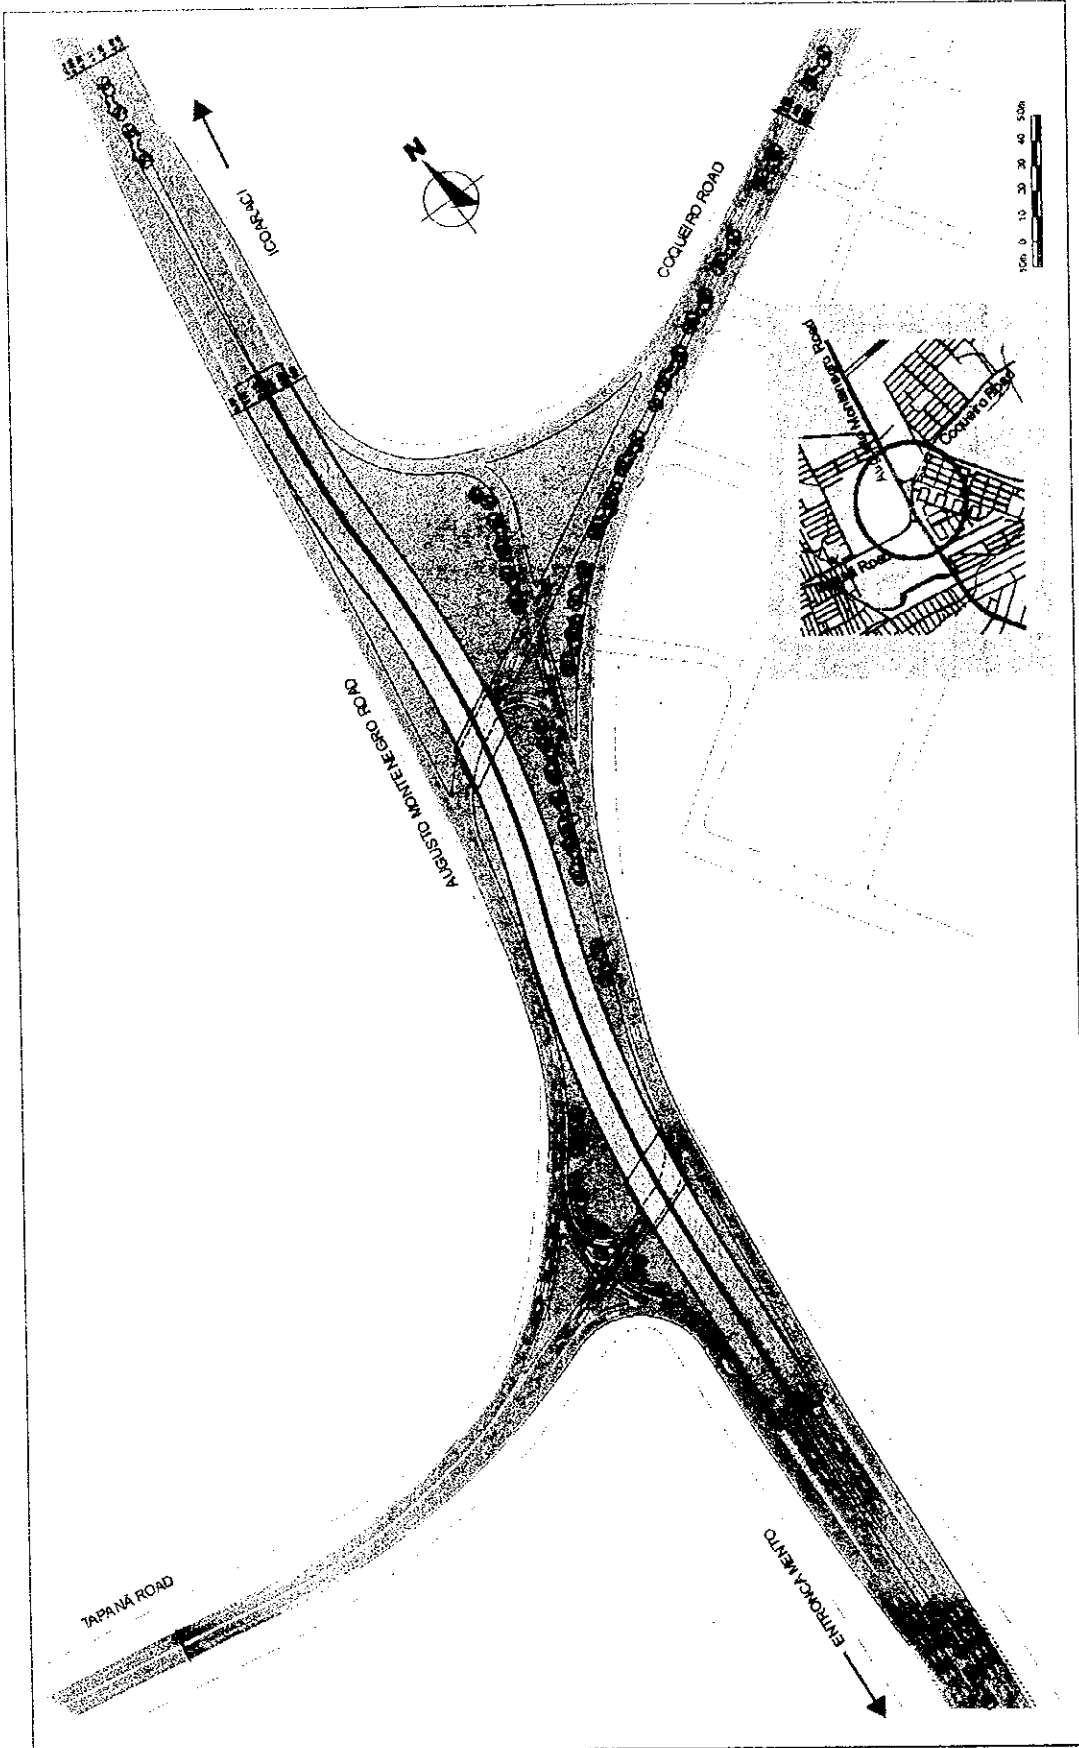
Intersection Augusto Montenegro Road / Coqueiro Road / Tapaná Road
